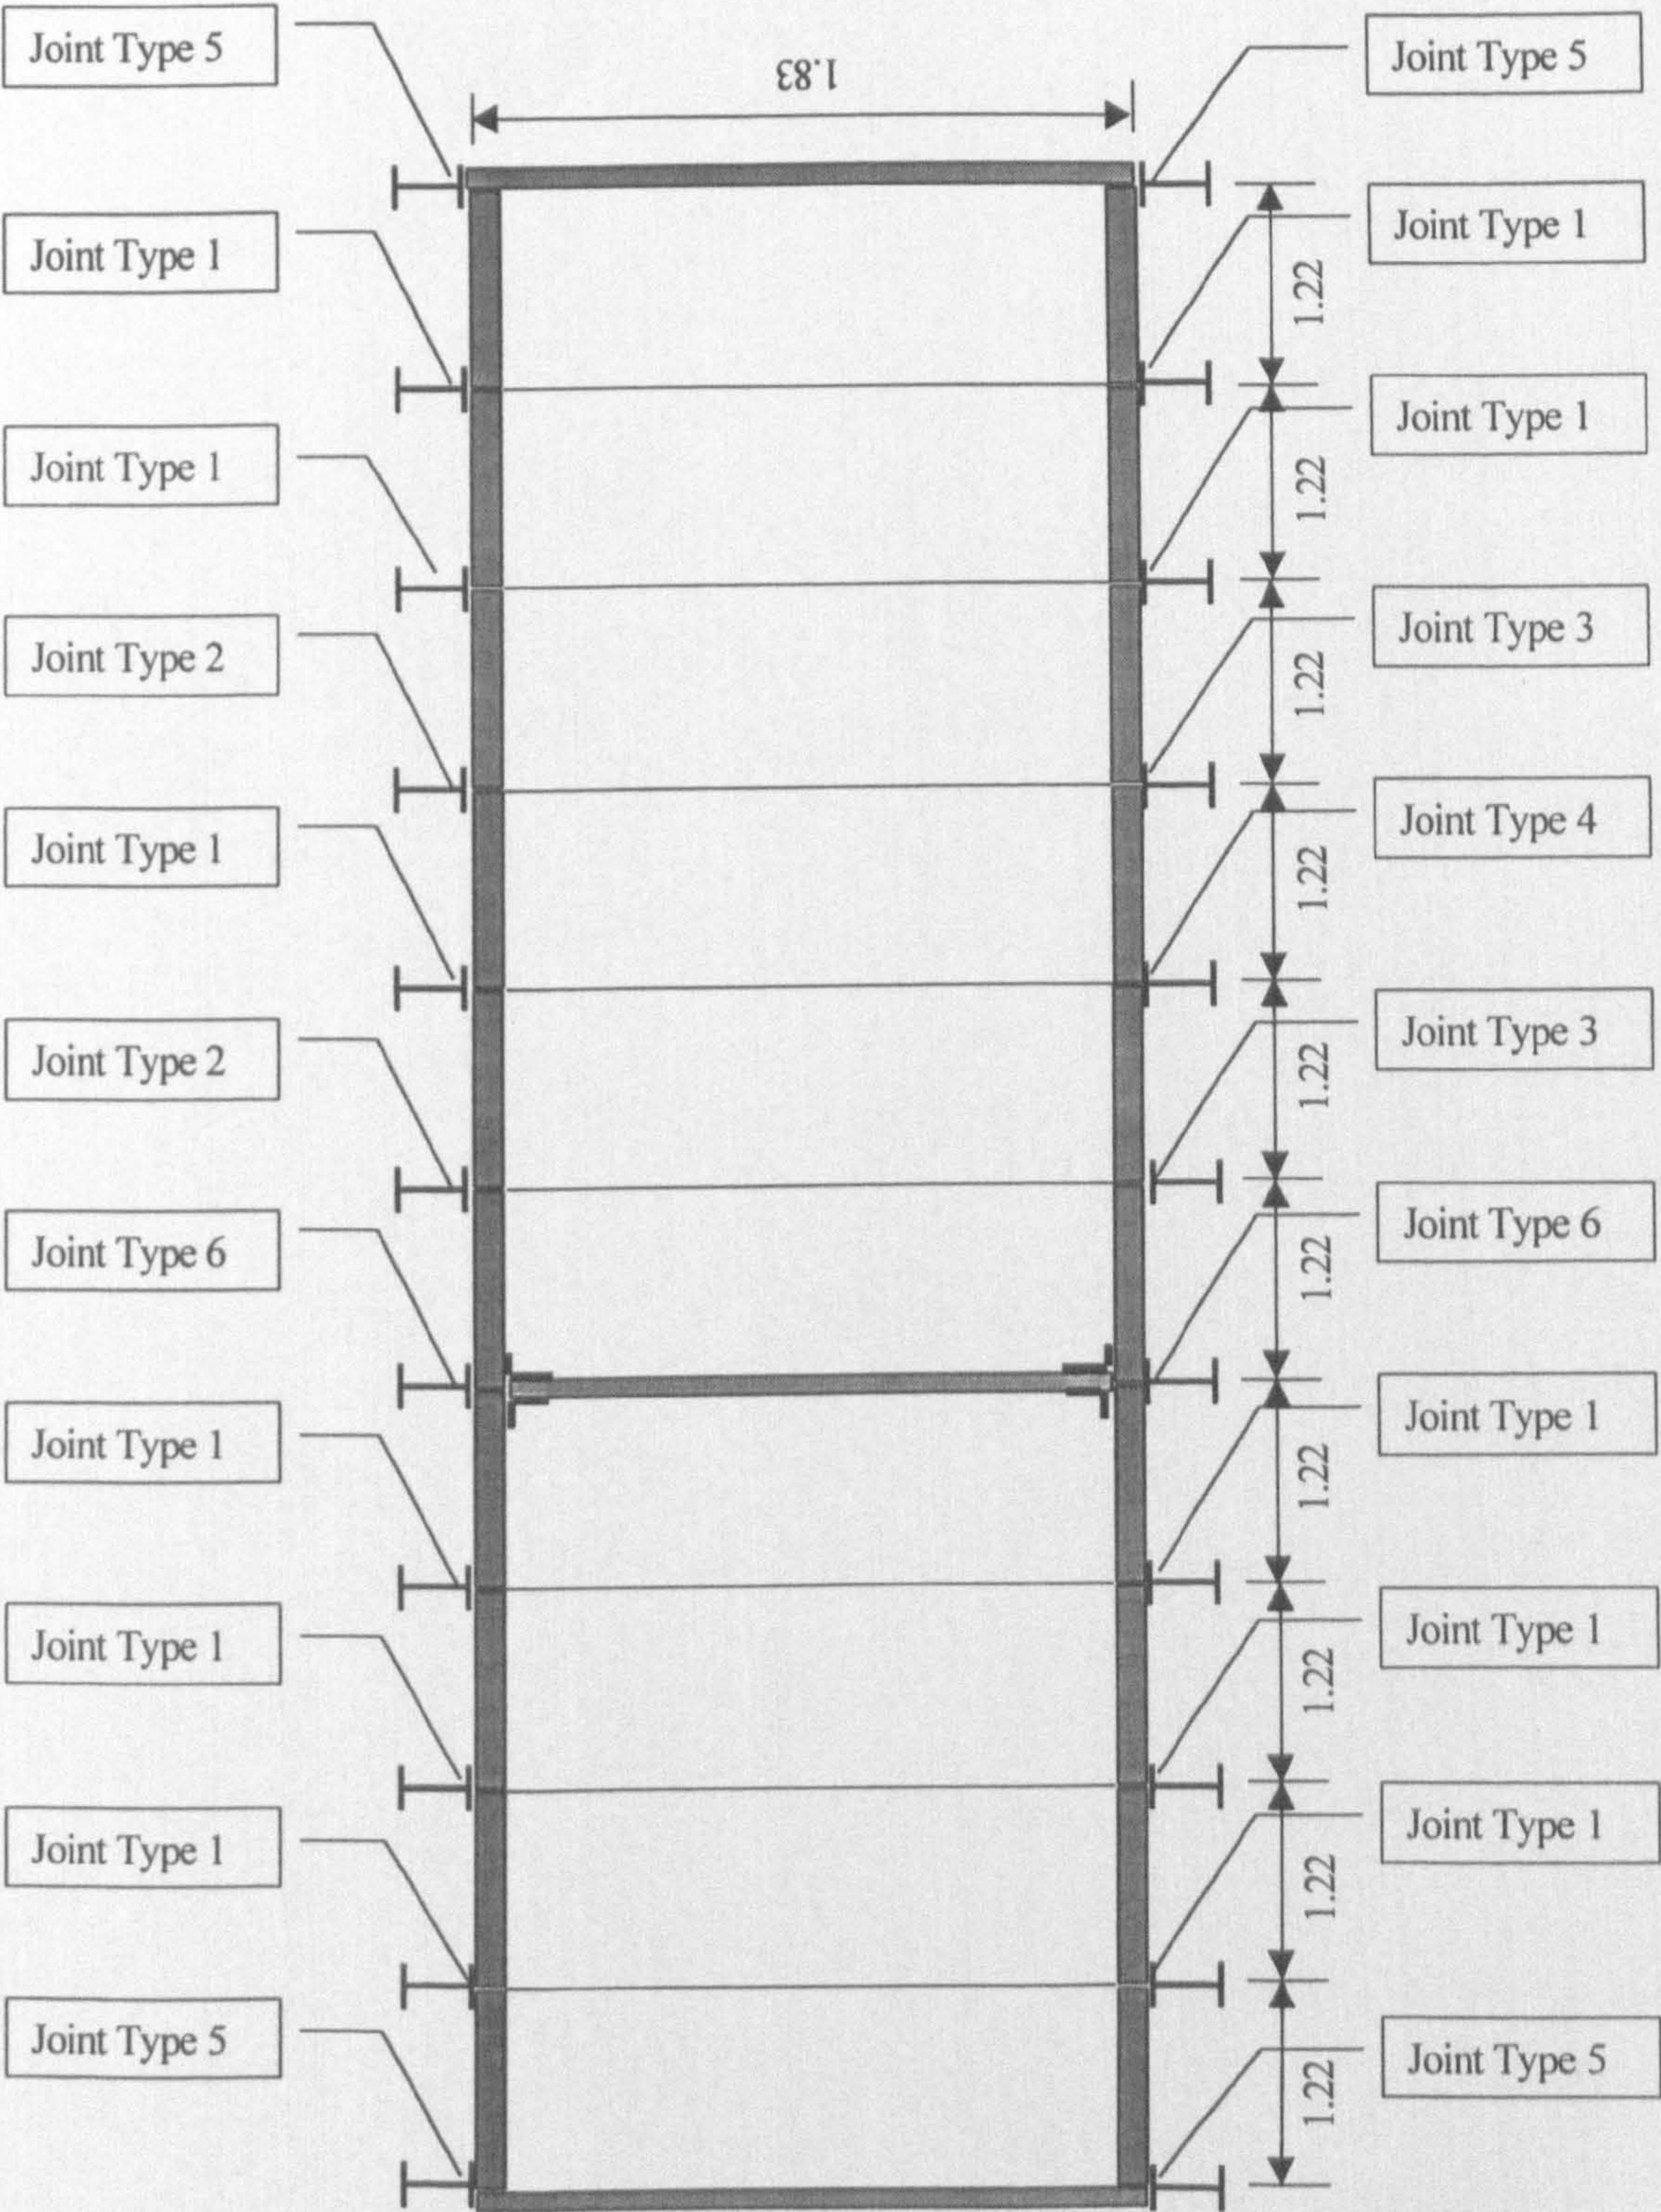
Tank structure: plan view on AA (Ref. Fig 5.24)
